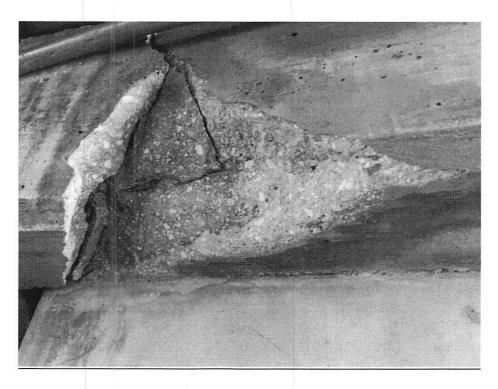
Cracked Haunch below third floor joist – No longitudinal rebar found here.
